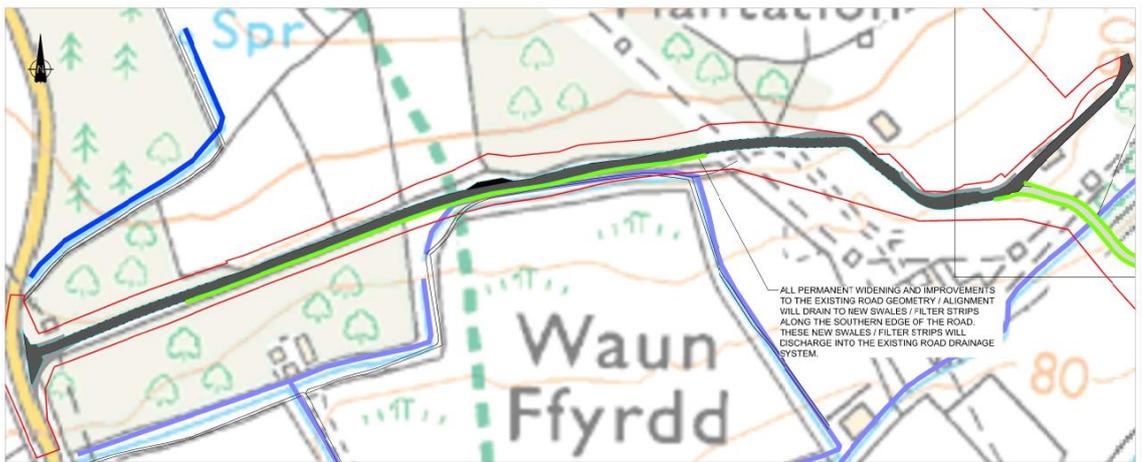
Plan showing nearby drains and watercourse to the site (West section)
